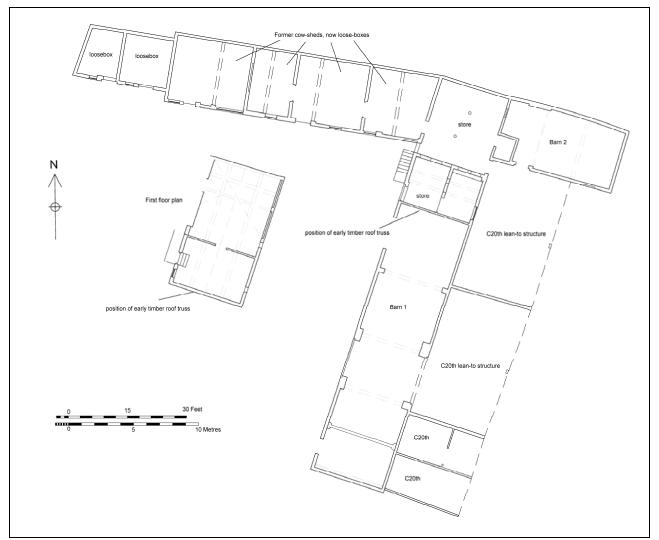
Range A floor plans (derived from plans supplied by Greenhatch Building Surveys Ltd).
